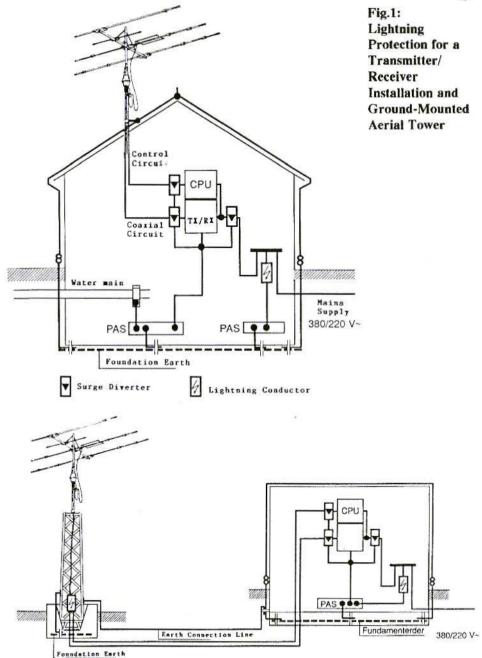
Lightning Protection for a Transmitter/Receiver Installation and Ground-Mounted Aerial Tower
